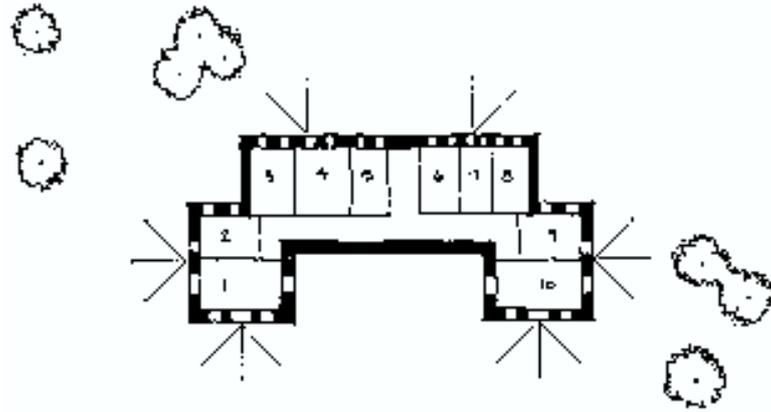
Plan View of an Apartment Building at Robert Taylor Homes With Nearby Trees
